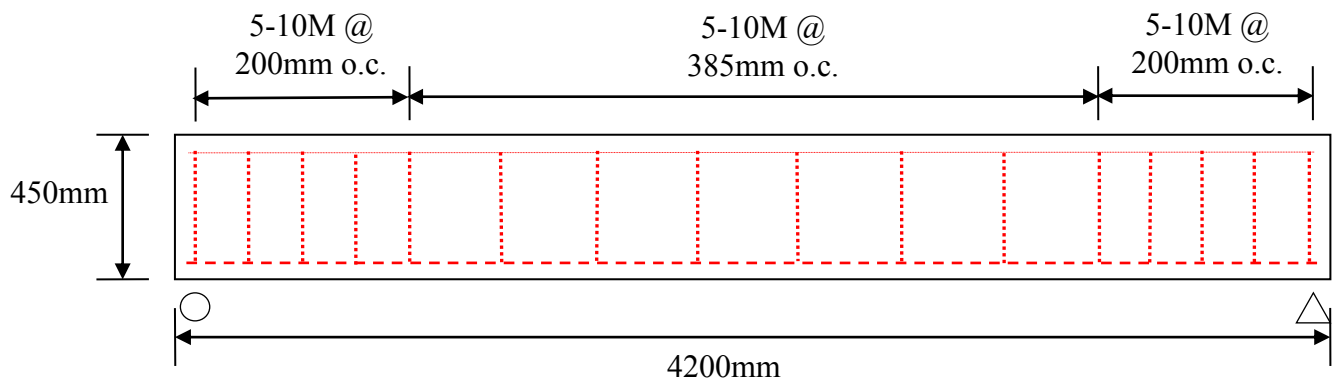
RB3 overall dimensions and stirrup locations, elevation view
